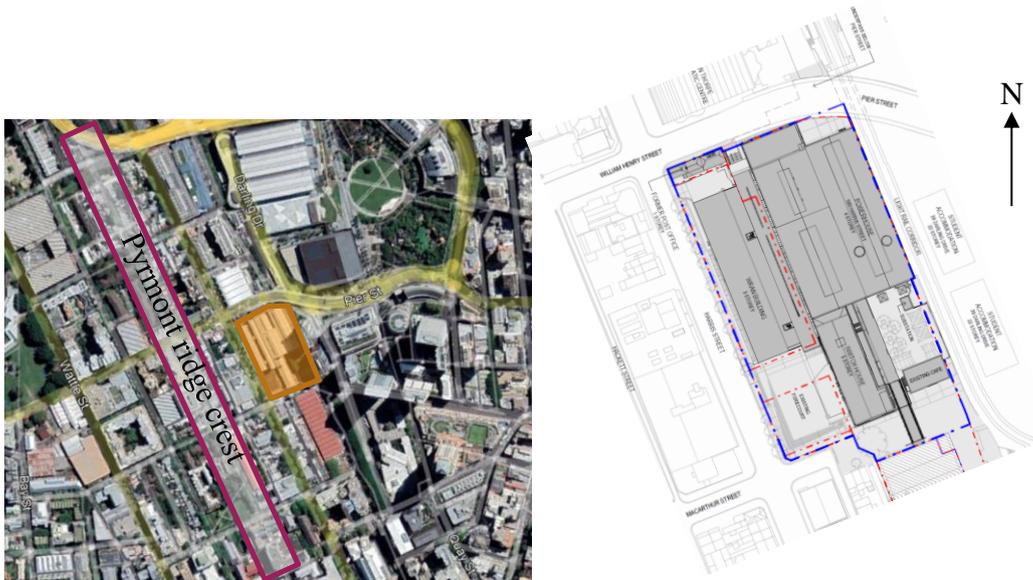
Site location (L Google Earth 2021) and existing site plan (R)
